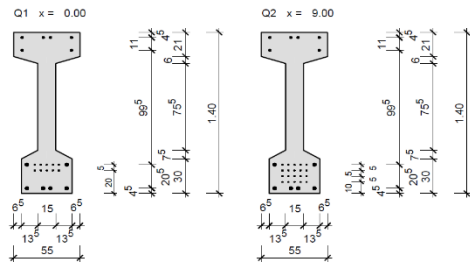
Main prestressed beam I140 used in prefabricated NSR structure
